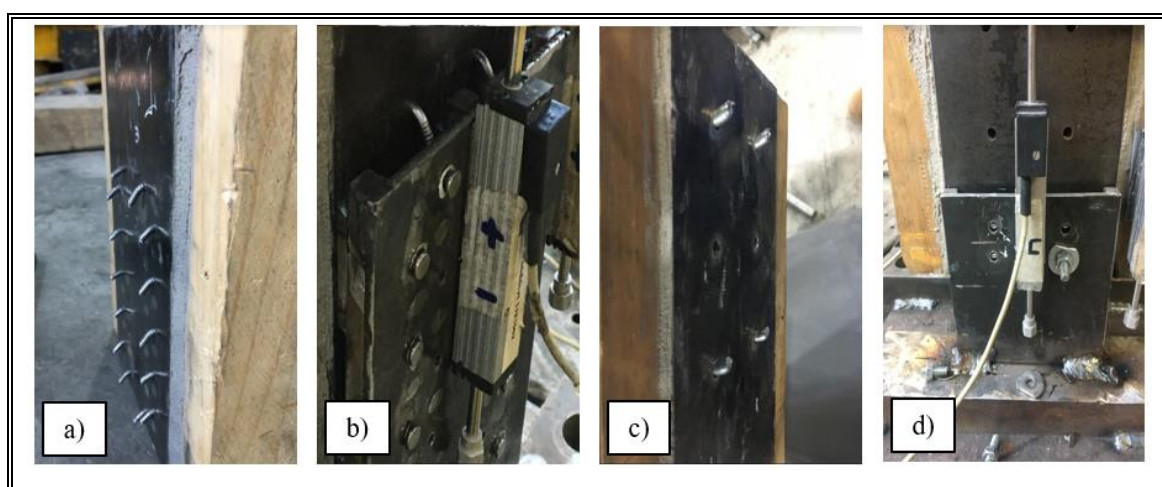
Failure modes for tested connections: a) MN_08; b) MN_12 (similar for 10 mm and 14 mm gap size); c) MB_08; d) CB_08_02
